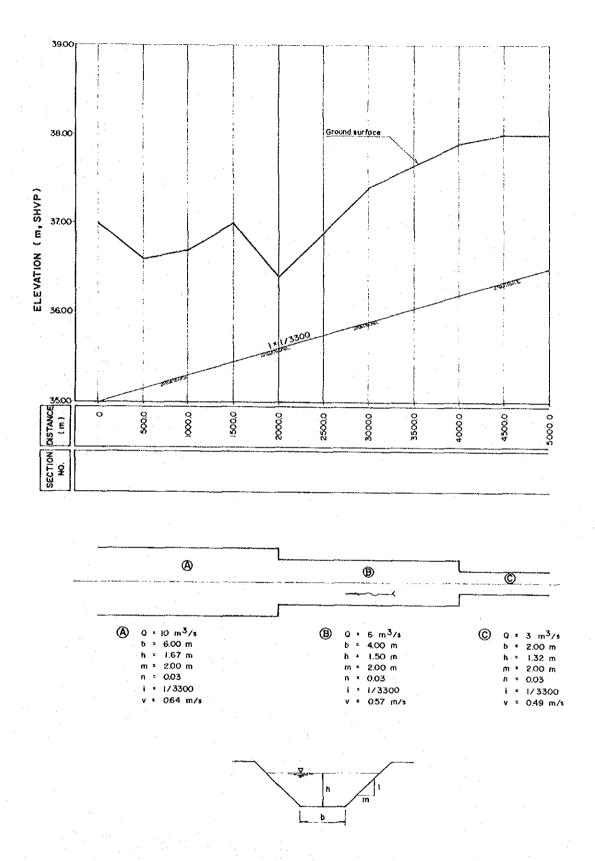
LONGITUDINAL PROFILE AND STANDARD CROSS - SECTION OF DRAINAGE CANAL OF LEFT WIDAS RETARDING BASIN (1/3)
